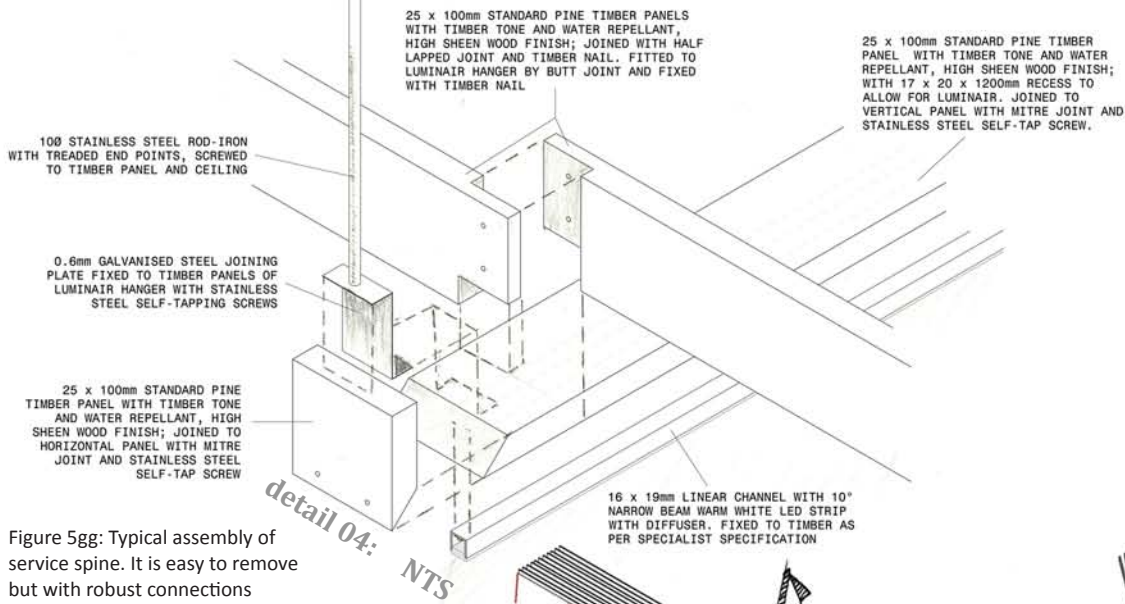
g: Typical assembly of service spine. It is easy to remove but with robust connections
